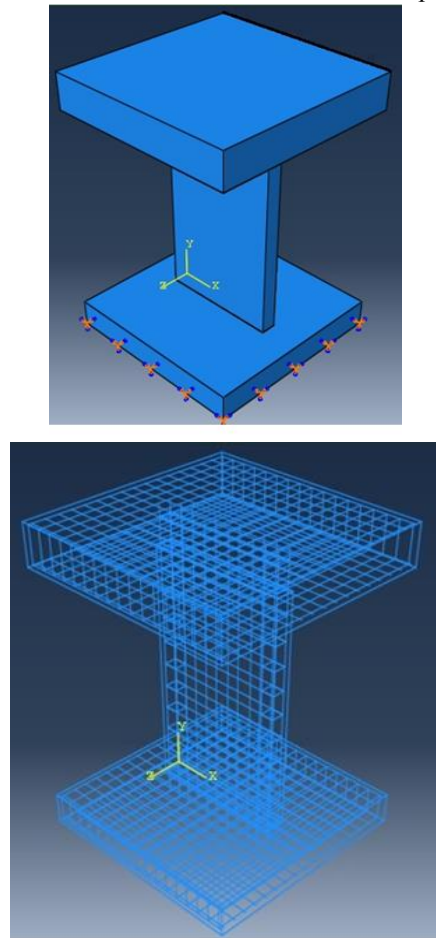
Finite element modeling of the pier wall in ABAQUS software
